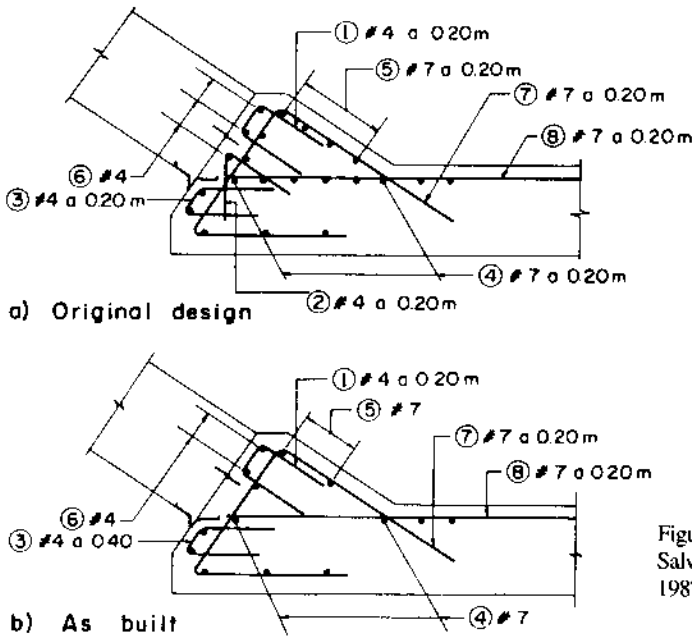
Antispalling steel in Salvajina Dam (Hacelas & Ramirez 1987).
